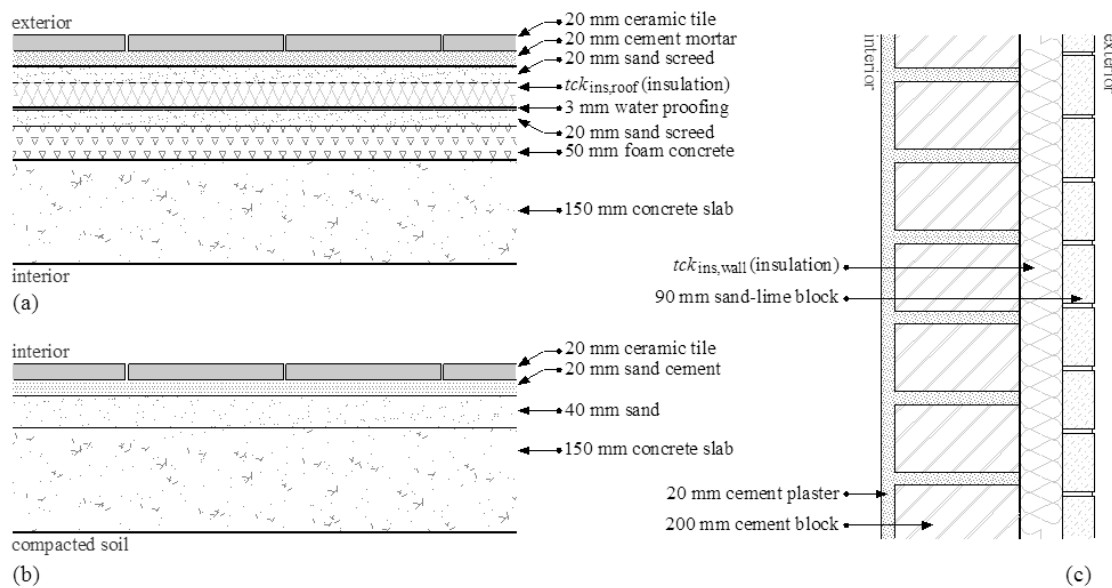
Cross-section of the construction elements used in the model: (a) roof; (b) floor, and (c) exterior wall (adapted from (Al-ajmi and Hanby 2008)).
